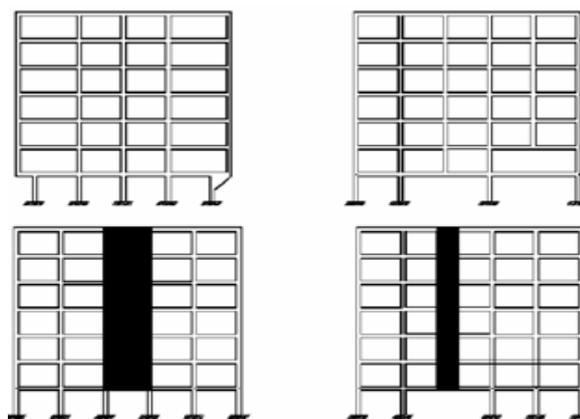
Type B3- Discontinuities of Vertical Structural Elements [9].
